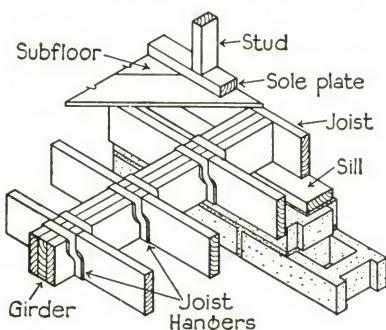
FRAMING JOIST LEVEL WITH TOP OF GIRDER
